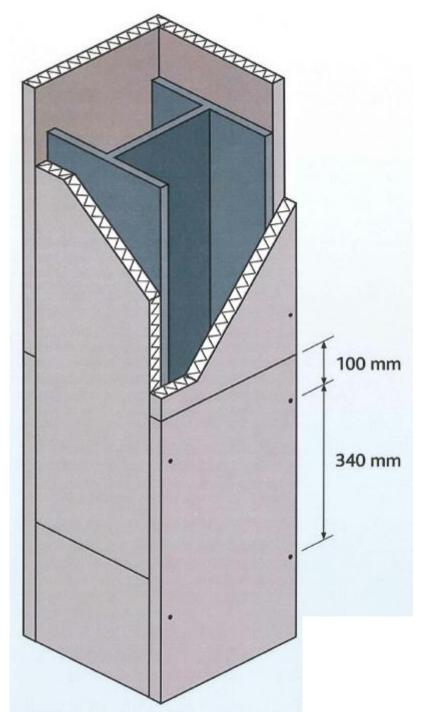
Position of screws in open profiled steel – four sided Screws 3.8×45 mm used for 25 mm fire protection Screws 5.0×90 mm used for 50 mm fire protection
